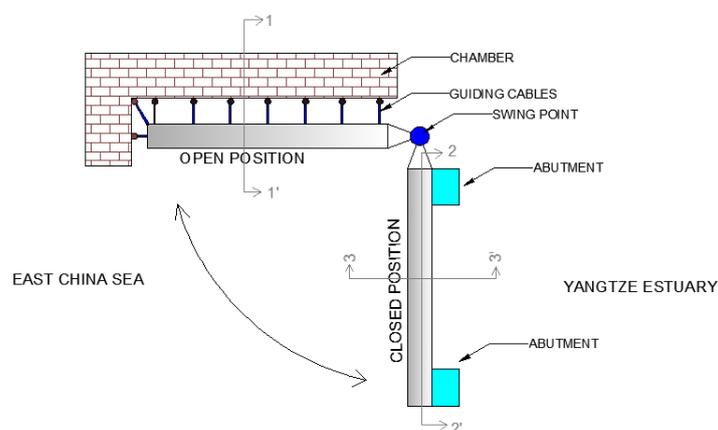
2. Plan view of the floating barge gate, not to scale (not to scale)
